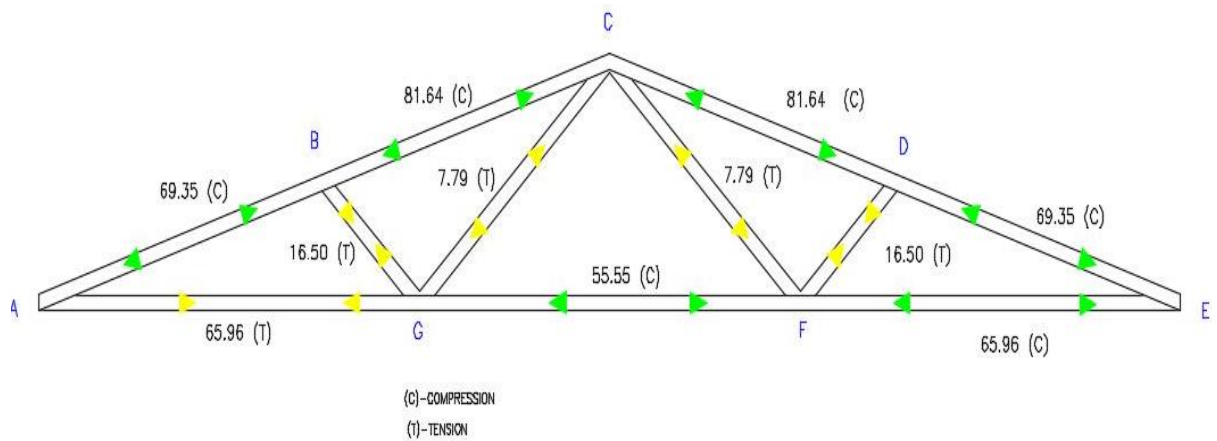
Member forces acting upon the roof truss from the 1.35DL + 1.0LL case.
